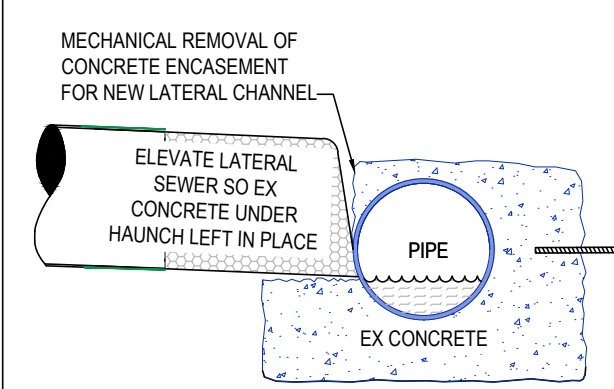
G1: PREPARATION, CONCRETE ENCASEMENT, AWAY FROM LATERAL
